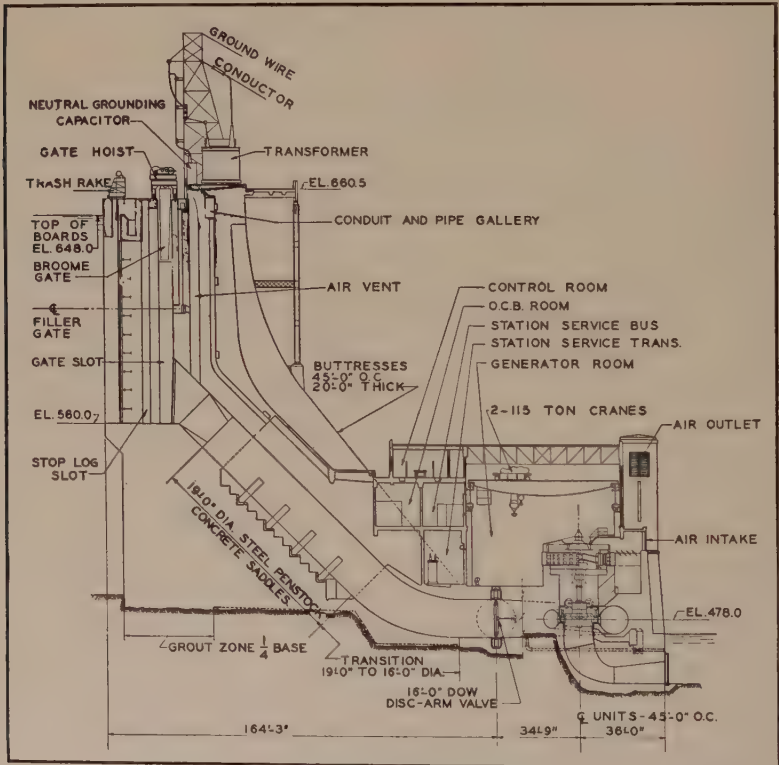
POWER HOUSE AND INTAKE. TYPICAL CROSS SECTION
